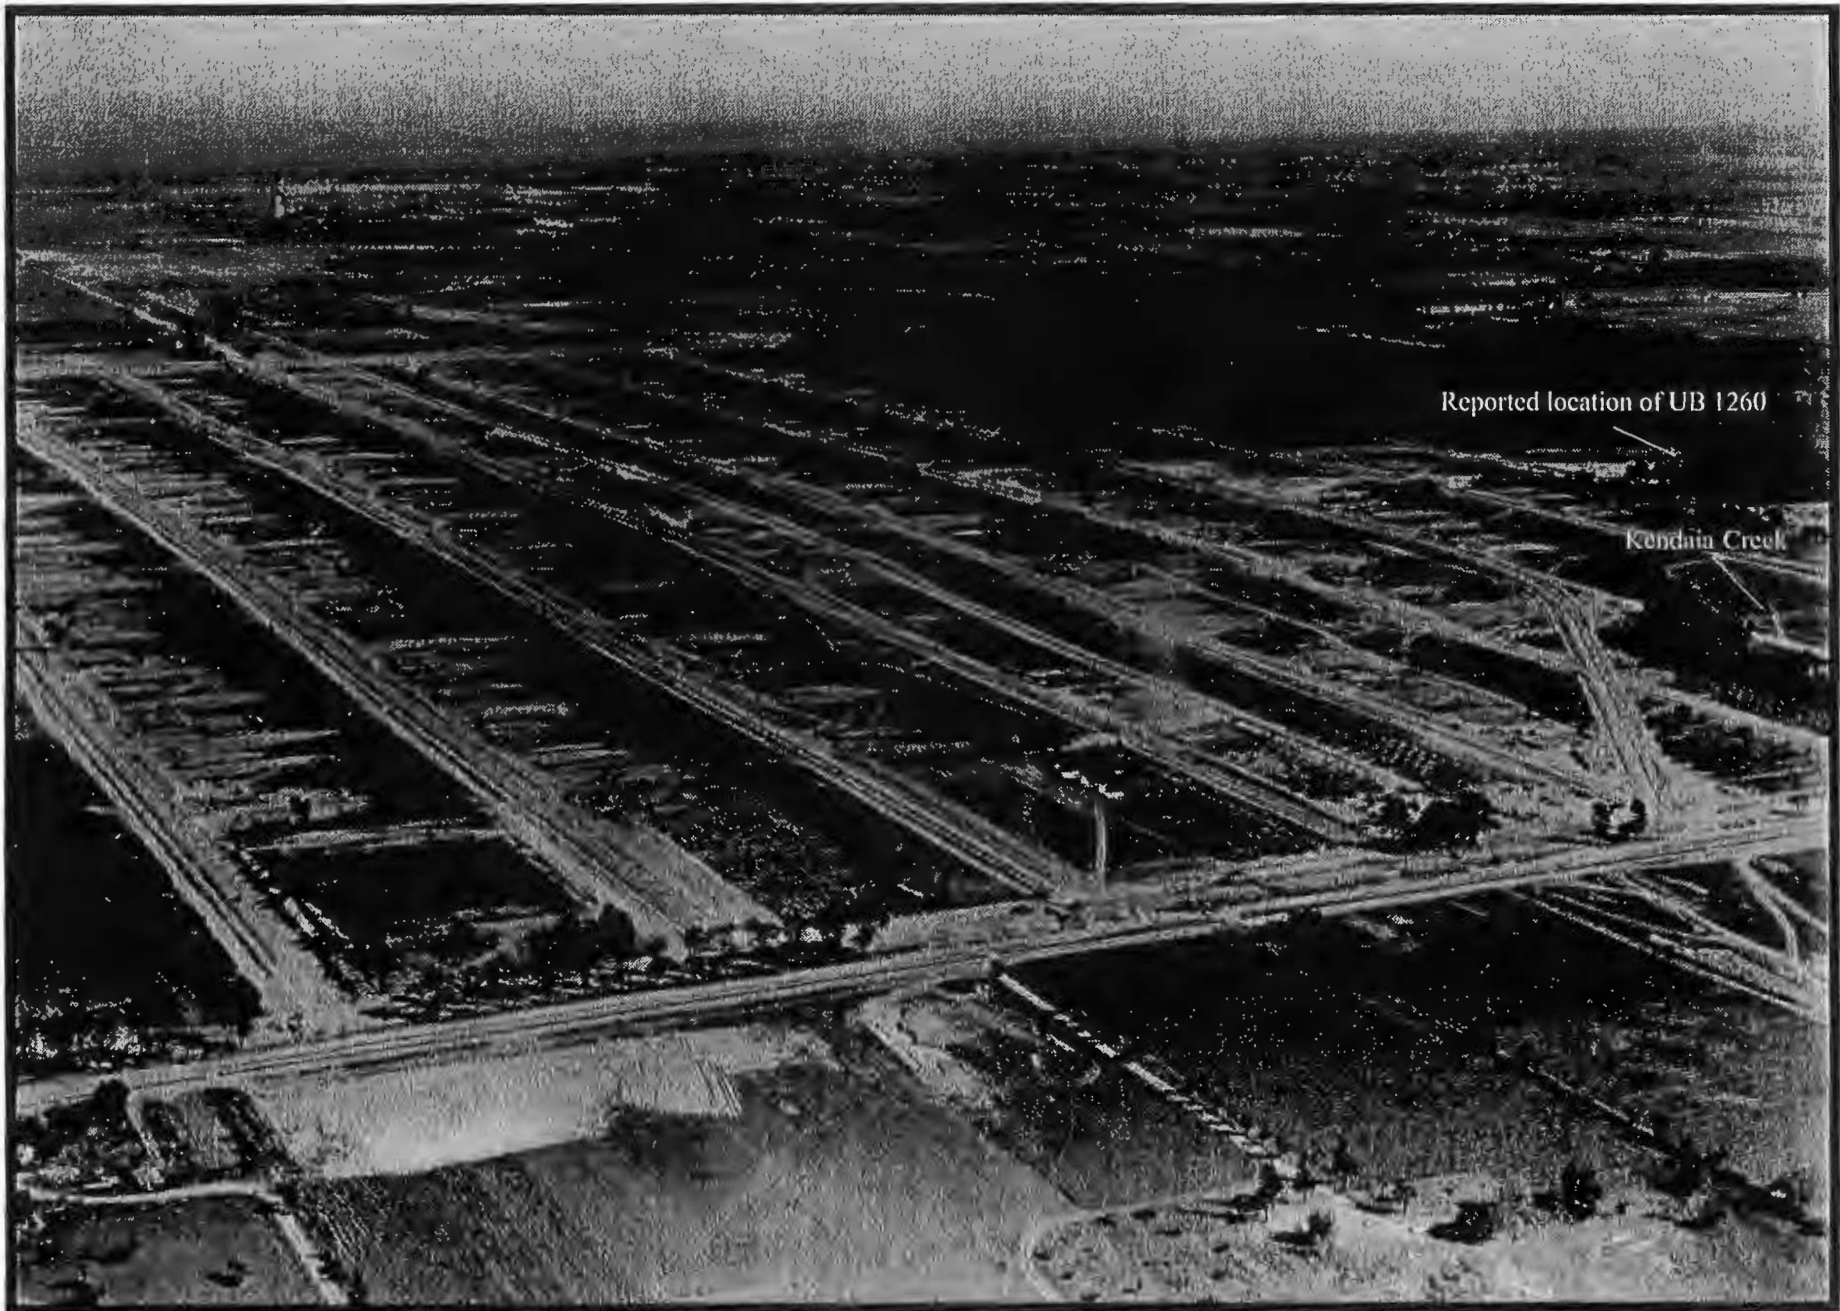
Aerial photograph of SEDA, September 1941, view to southeast showing igloo construction (from SEDA archives).
